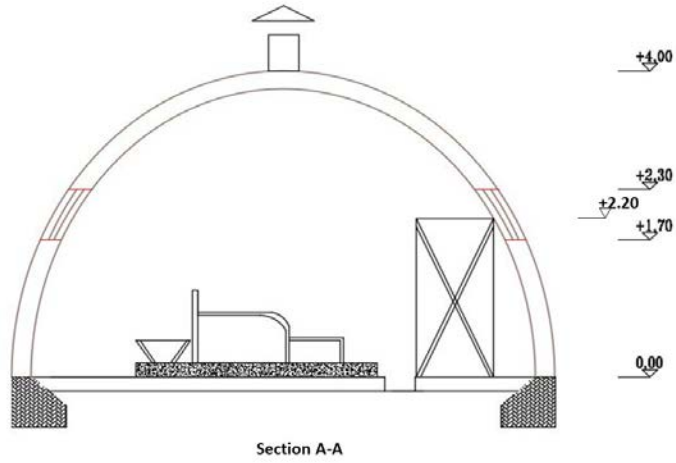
the sectional view of 10-headed prefabricated barn with lightweight concrete
